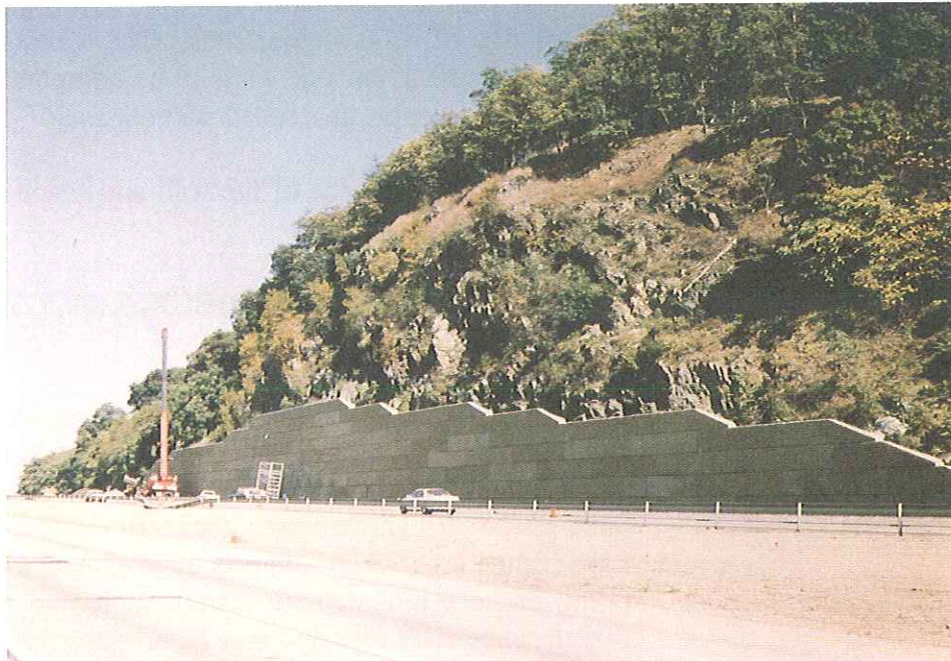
Completed concrete wall. Note the pleating lines and appearance (Courtesy New York Thruway Authority).
